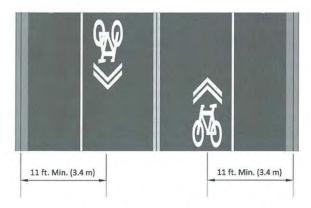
Typical Shared-Lane Marking Cross Section on Street with Parking
